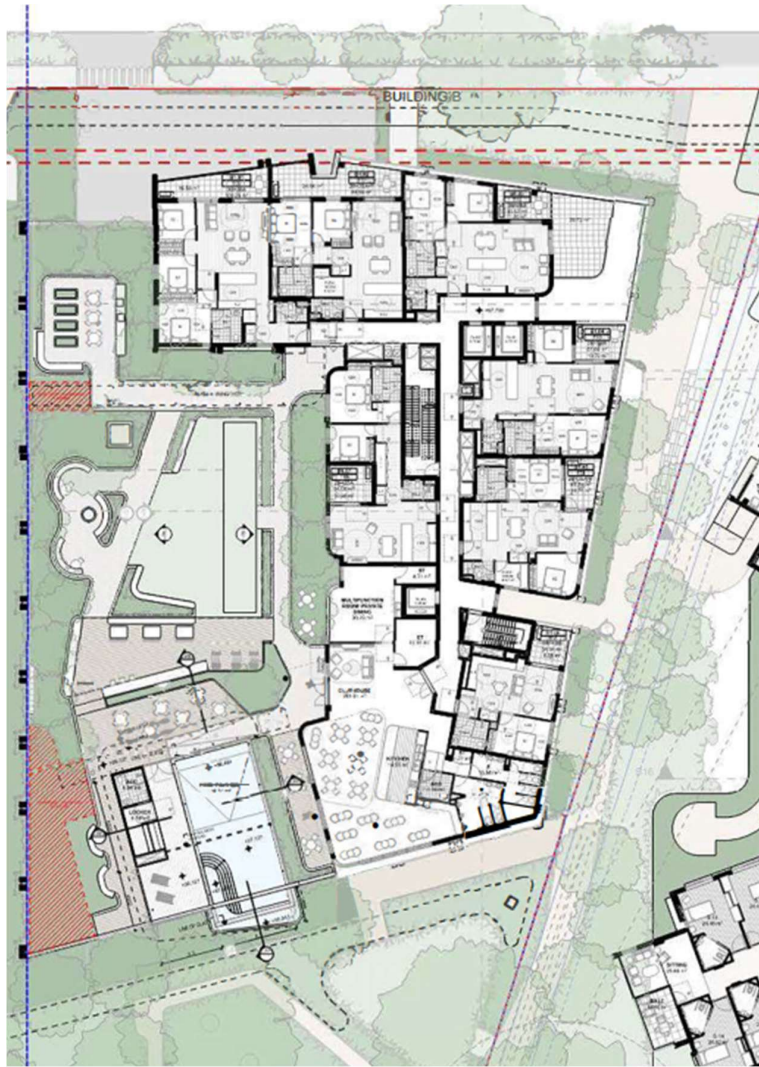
Approved and Proposed Level 01 Stage 01 of Building B (1 of 2)
